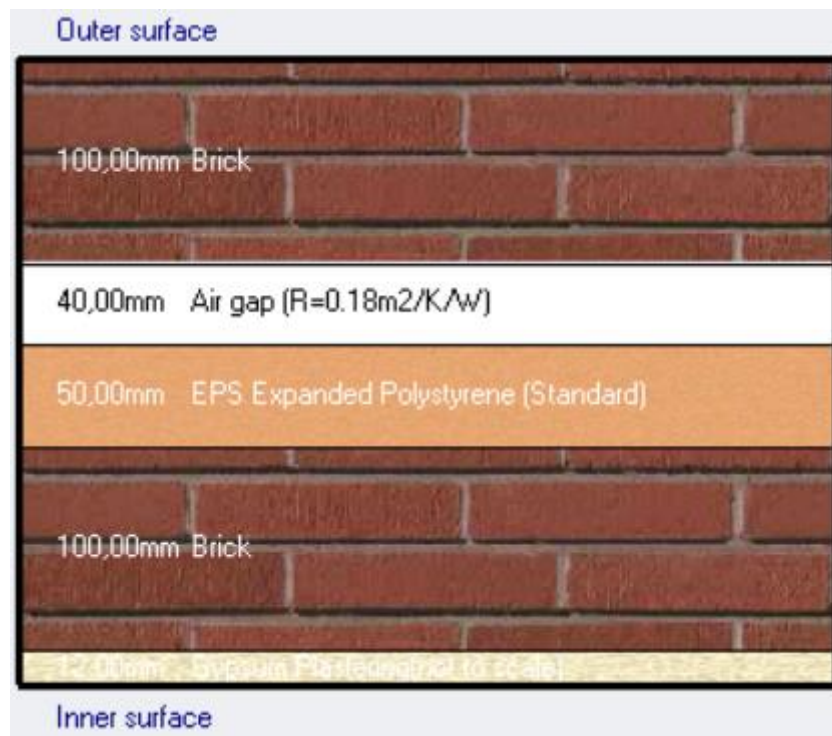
Detail of the exterior wall of the terraced house in DesignBuilder (low insulation)
